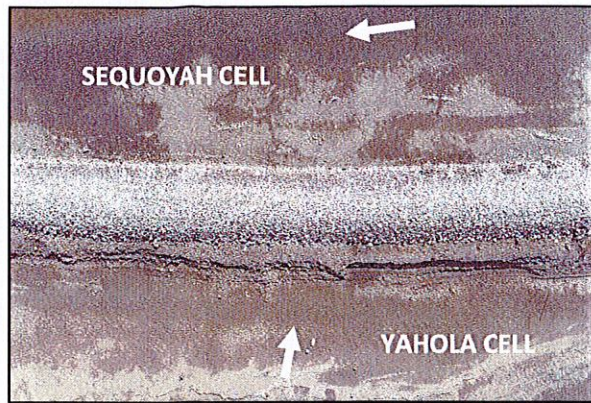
showing the typical existing berm at the West Gate Berm Structure. White arrow shows approx. project location.
